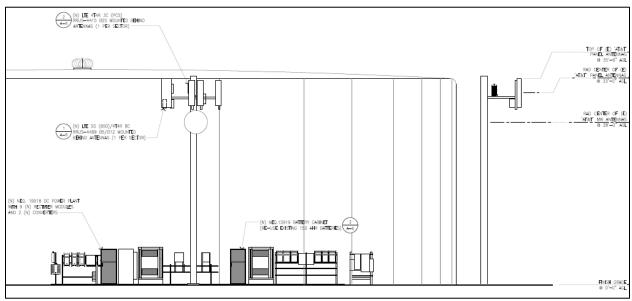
Elevation view of proposed modifications in Sector A and Sector B (Source: Plans, page A-4, panel 2).
